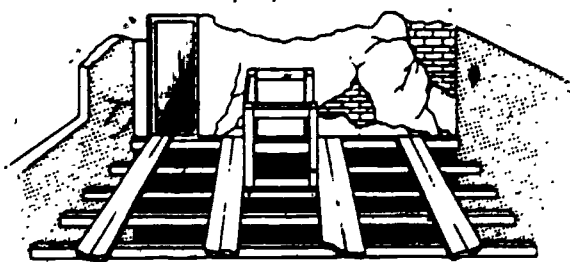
Floors should be opened up to let debris through but sufficient boards should be left for access.
